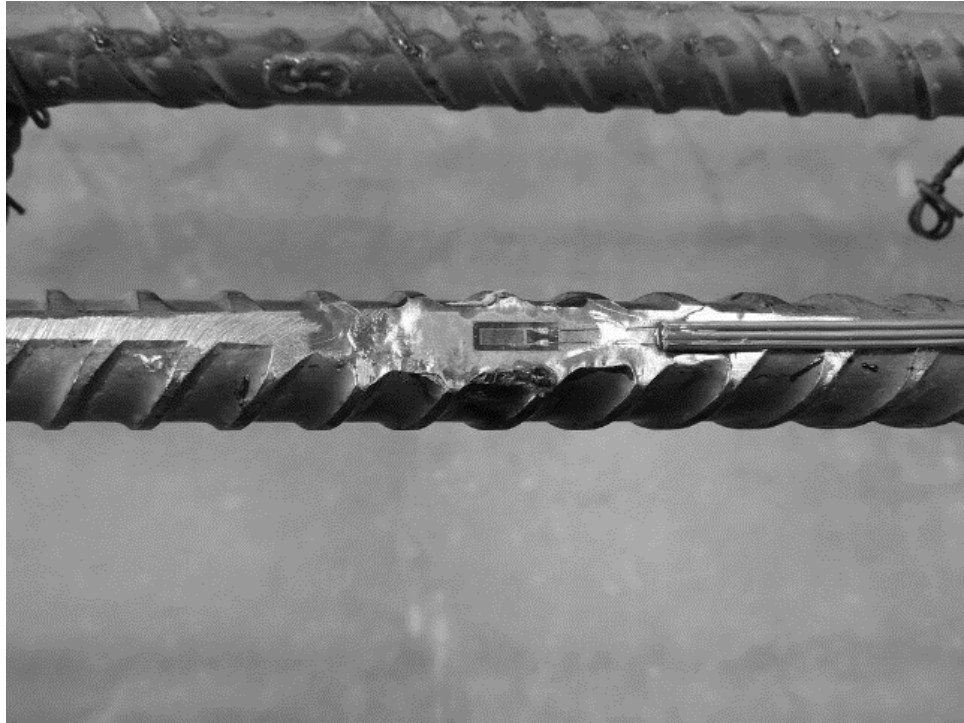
Strain gauge adhered to longitudinal reinforcement
